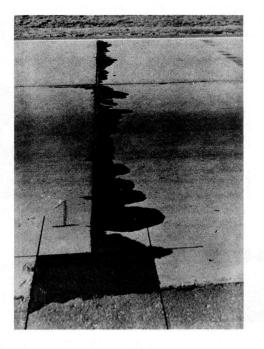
Expansion joints 1U and 5U on Rt. 15 in Union.
